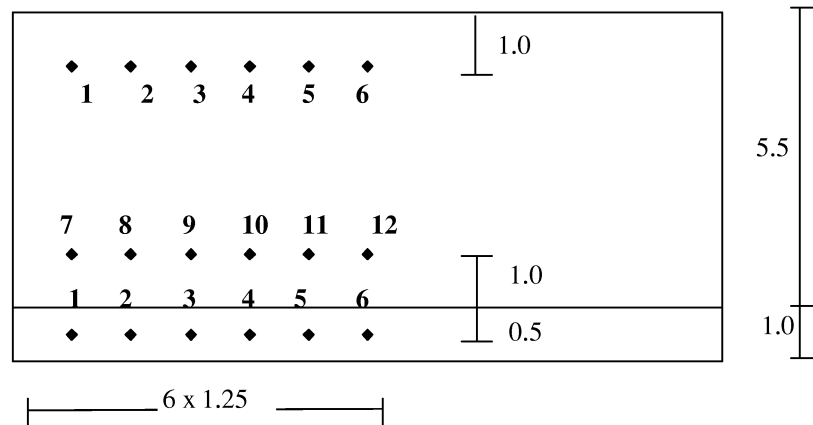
Location of the strain gauges in the wall and foundation in section 2.
